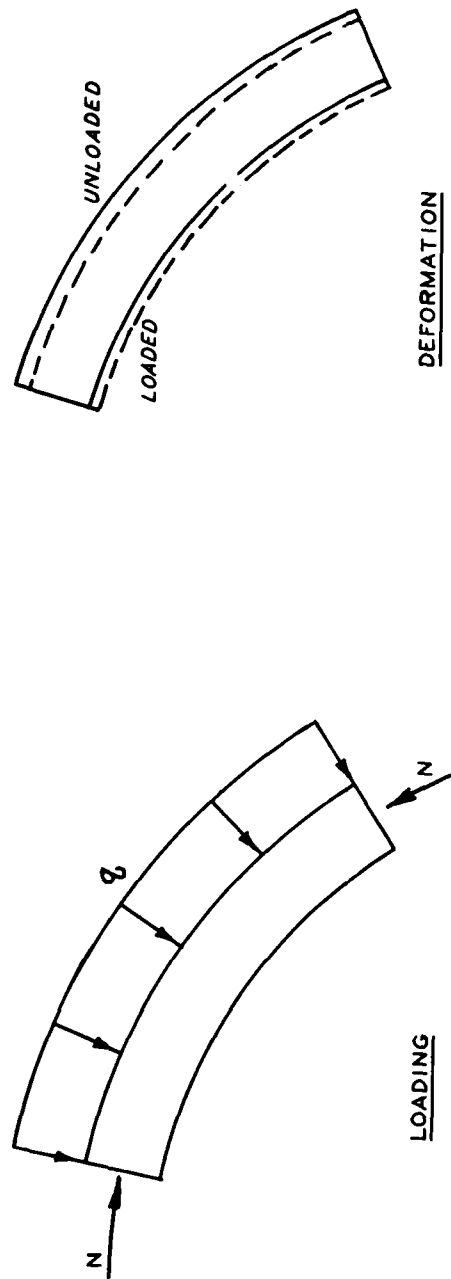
Behavior of circular tunnel wall under uniform external pressure
